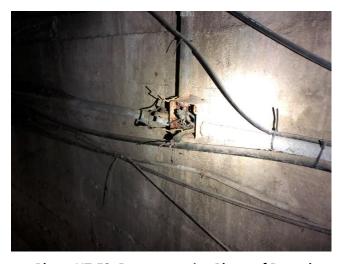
Representative Photo of Rusted Electrical Box with Exposed Conductors
